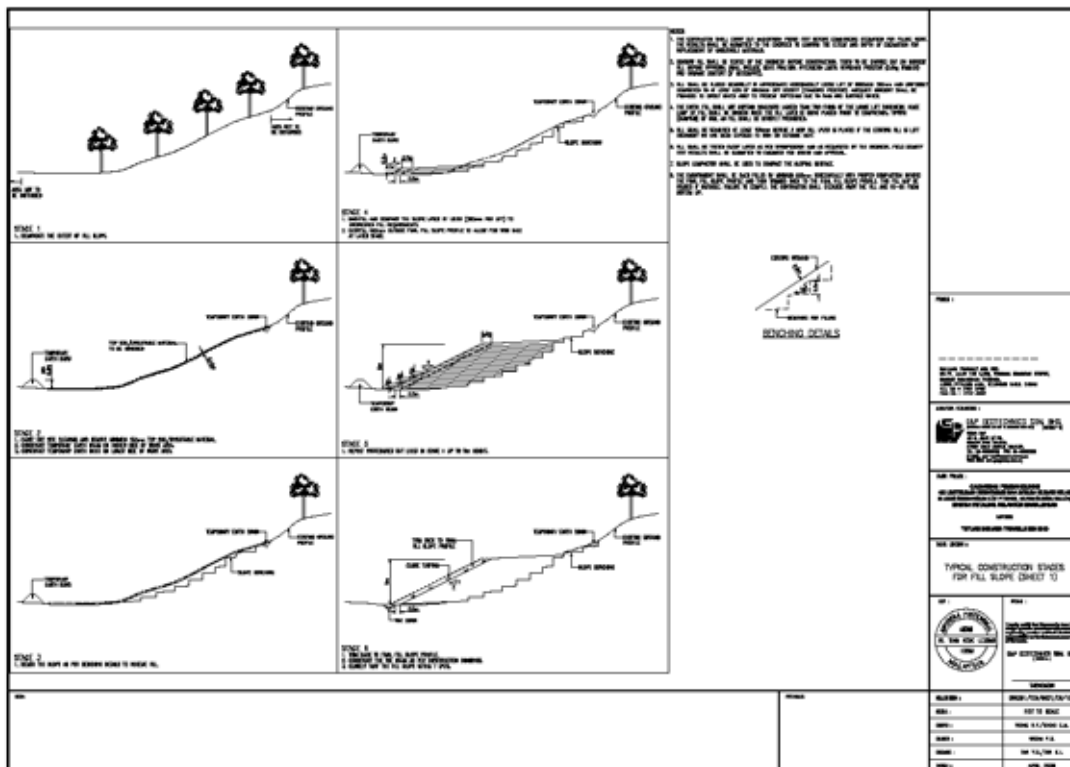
Sample construction drawing on construction sequence for fill slopes
